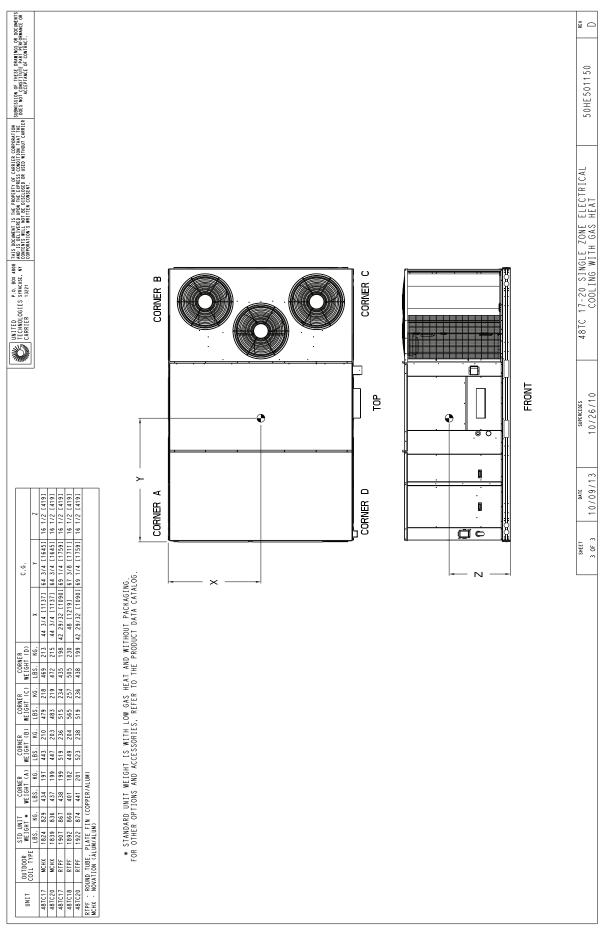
Unit Dimensional Drawing – 18 Size Unit (cont.)
